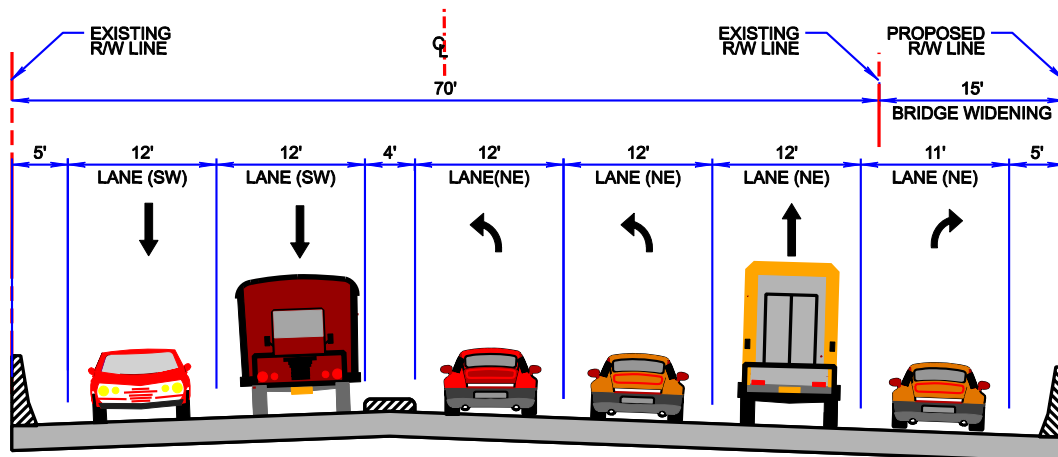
L 6-Lane Typical Bridge Section at NW 138th Street (2018)
